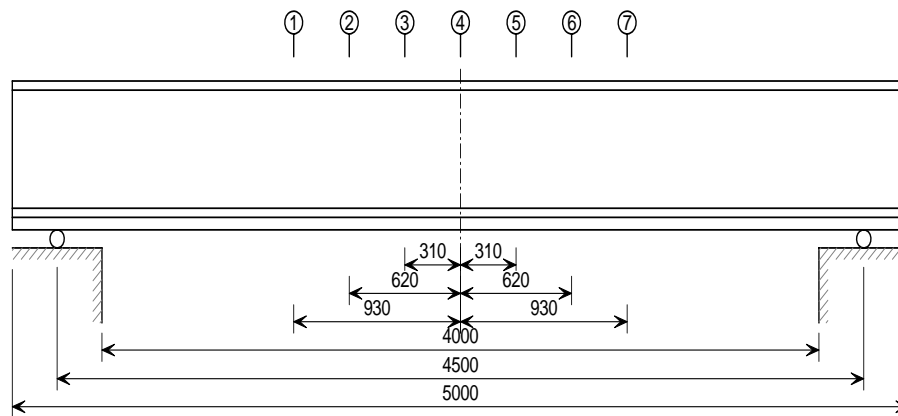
Longitudinal arrangement – Position of thermocouple cross sections
